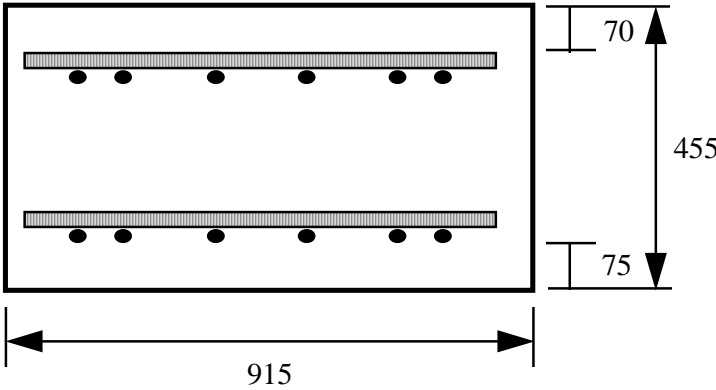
Layout of Reinforcement in Specimens M28 and R28
